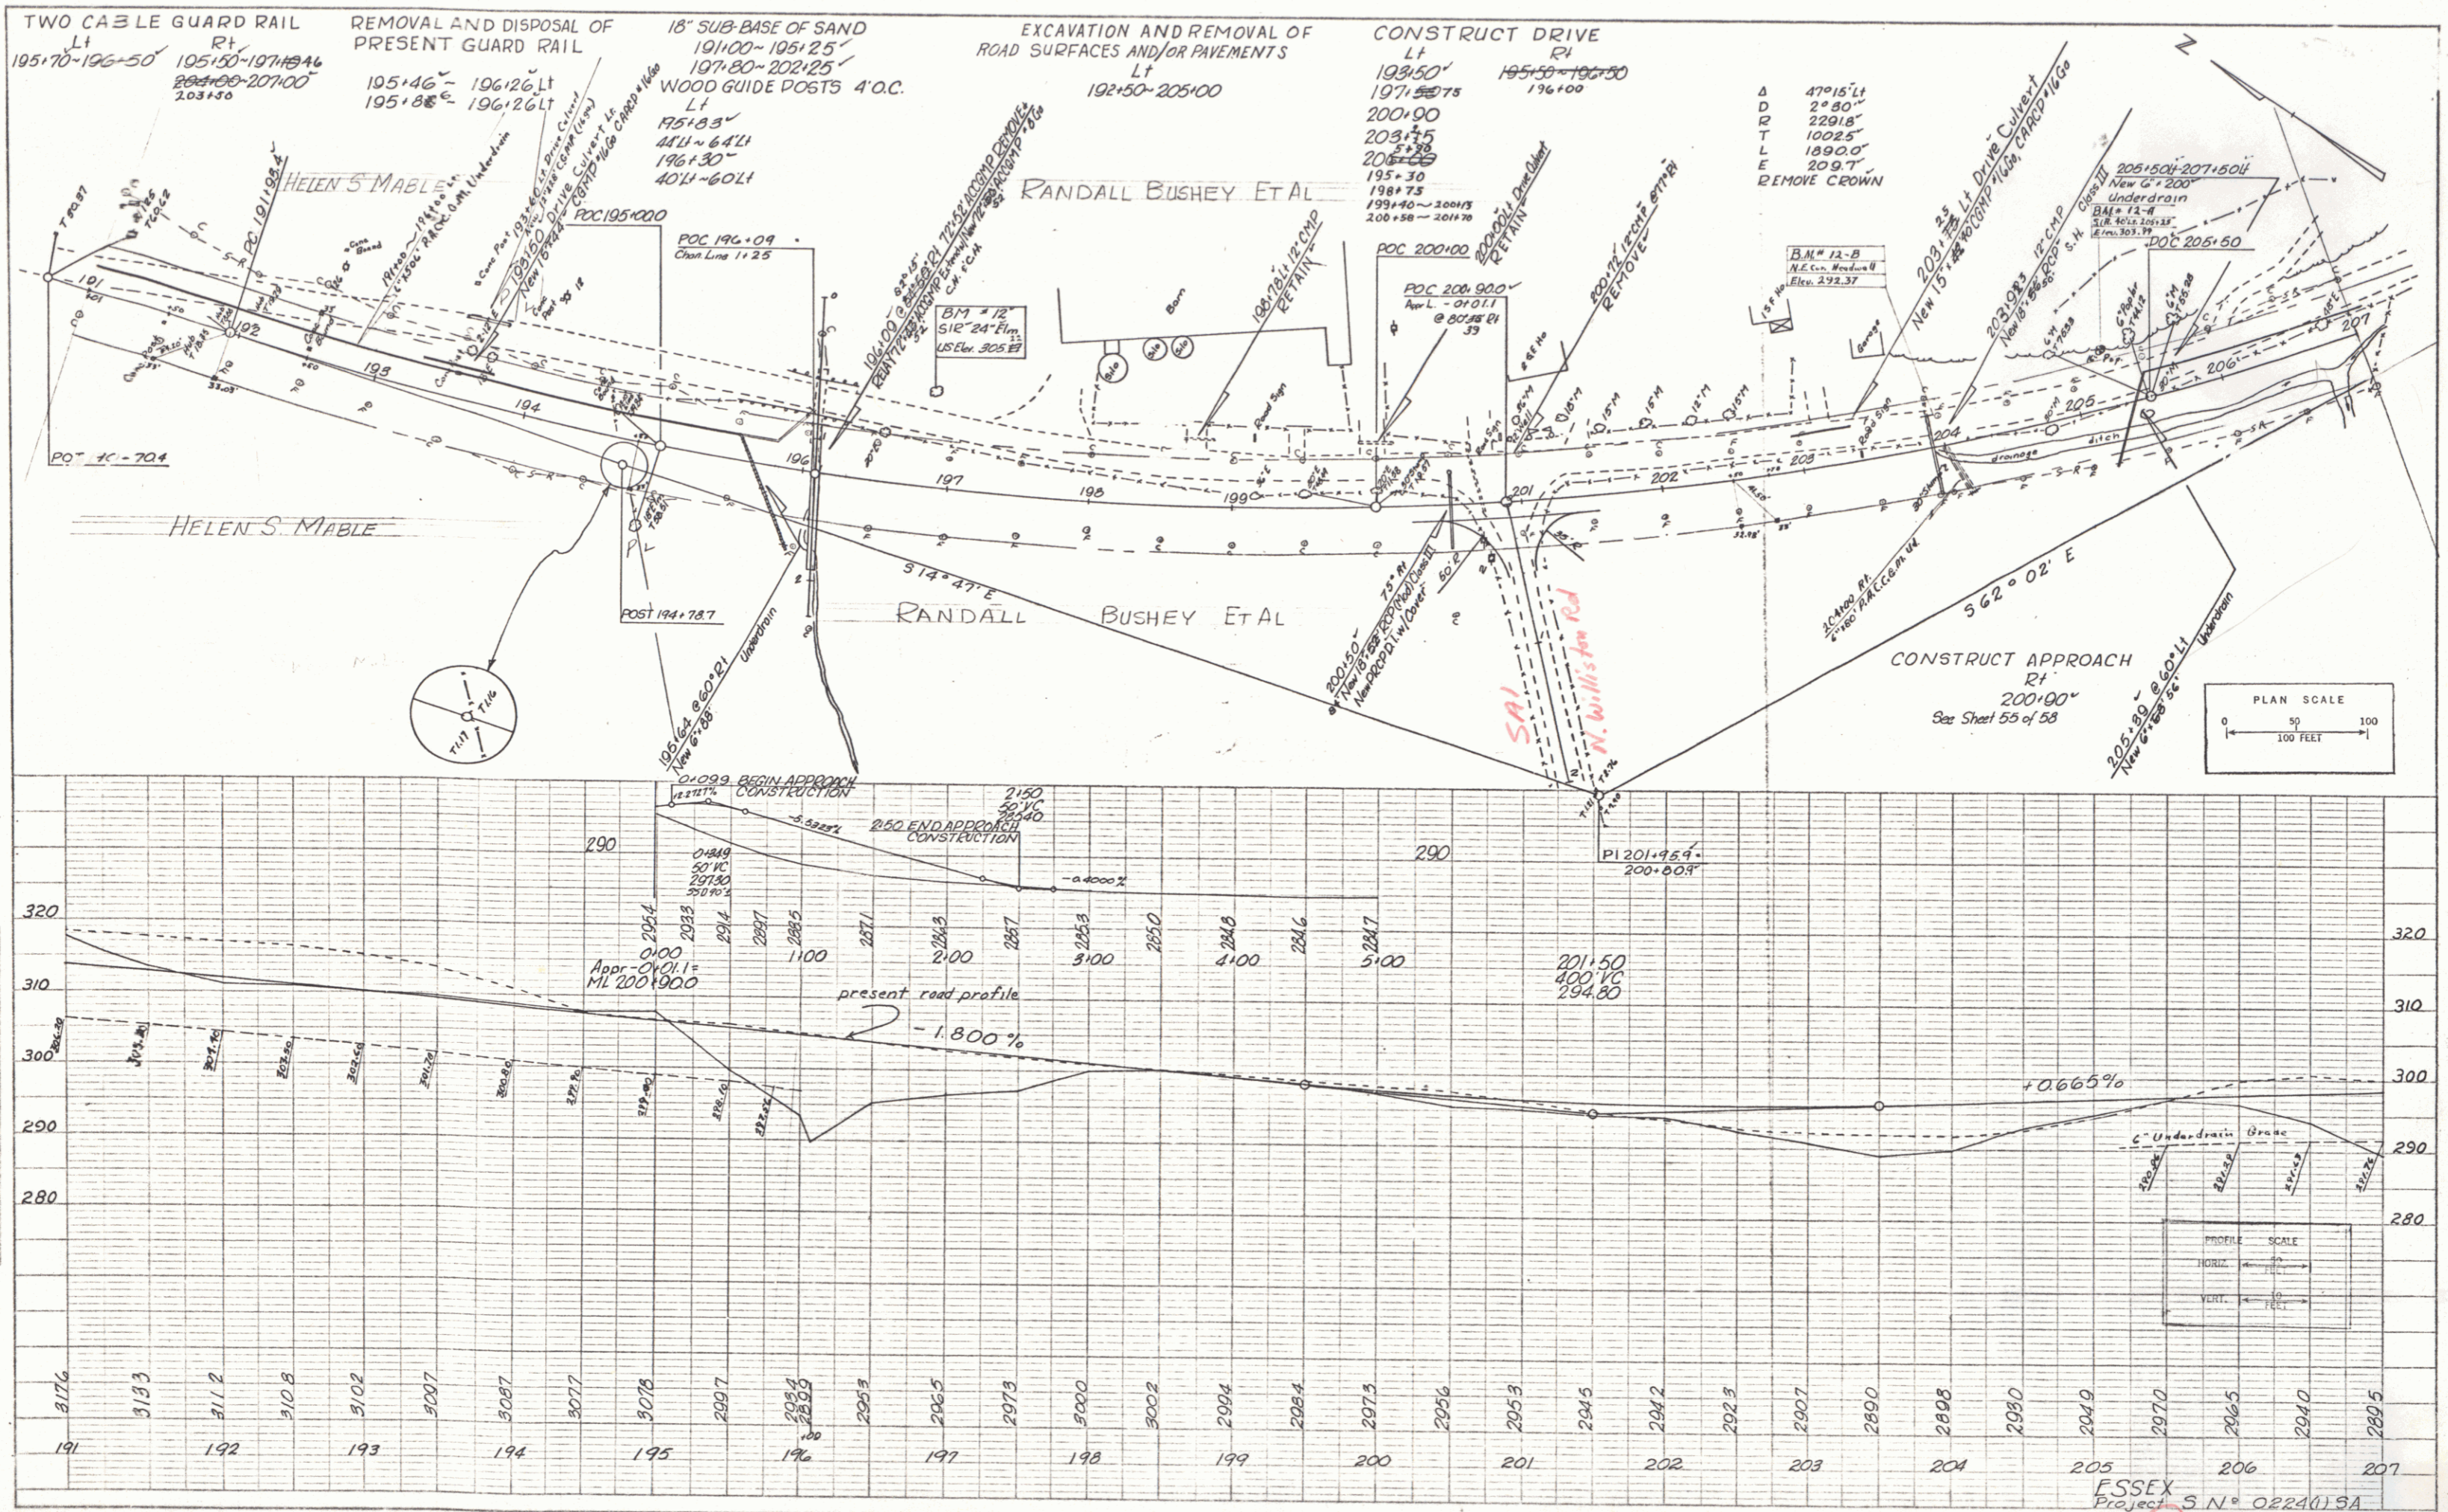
PLAN, PROFILE, & E. & S. STANDARD
